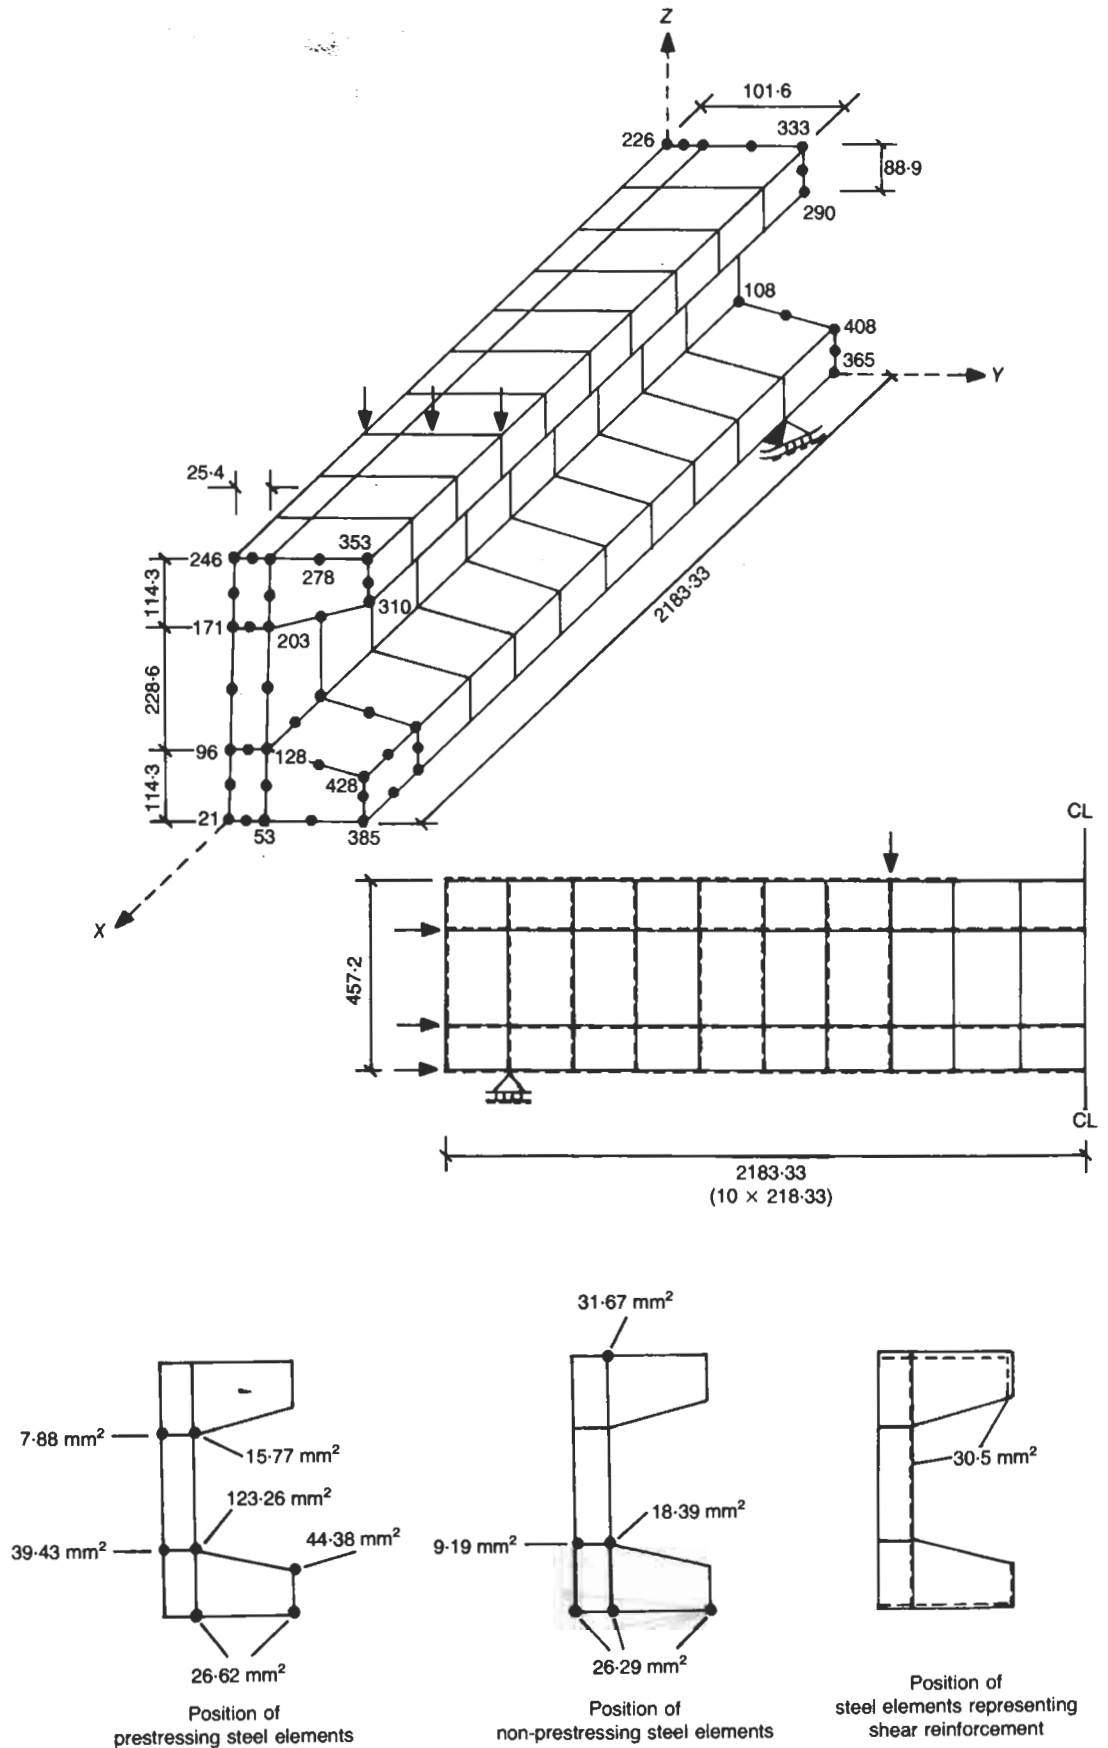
Beam CW12: dimensions and reinforcement detailing
